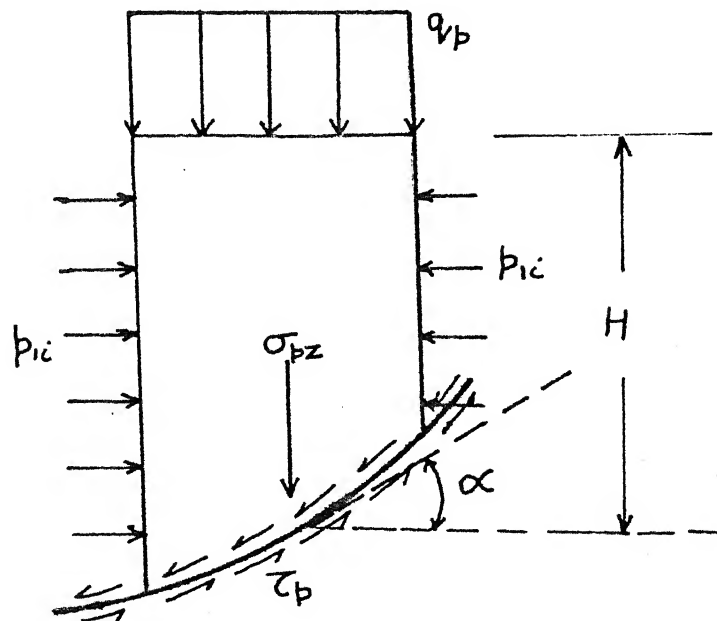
FORCES ACTING ON A TYPICAL SLICE OF STONE COLUMN
